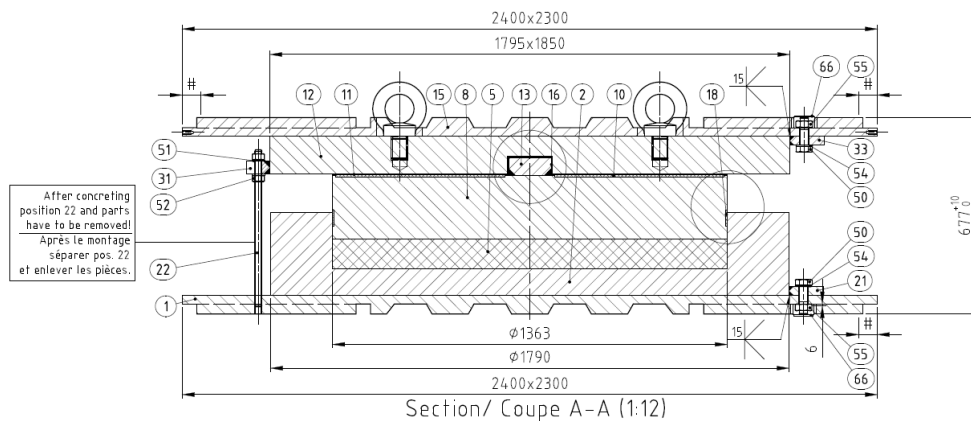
Cross section drawing of guided-sliding bearing at Pier 32
